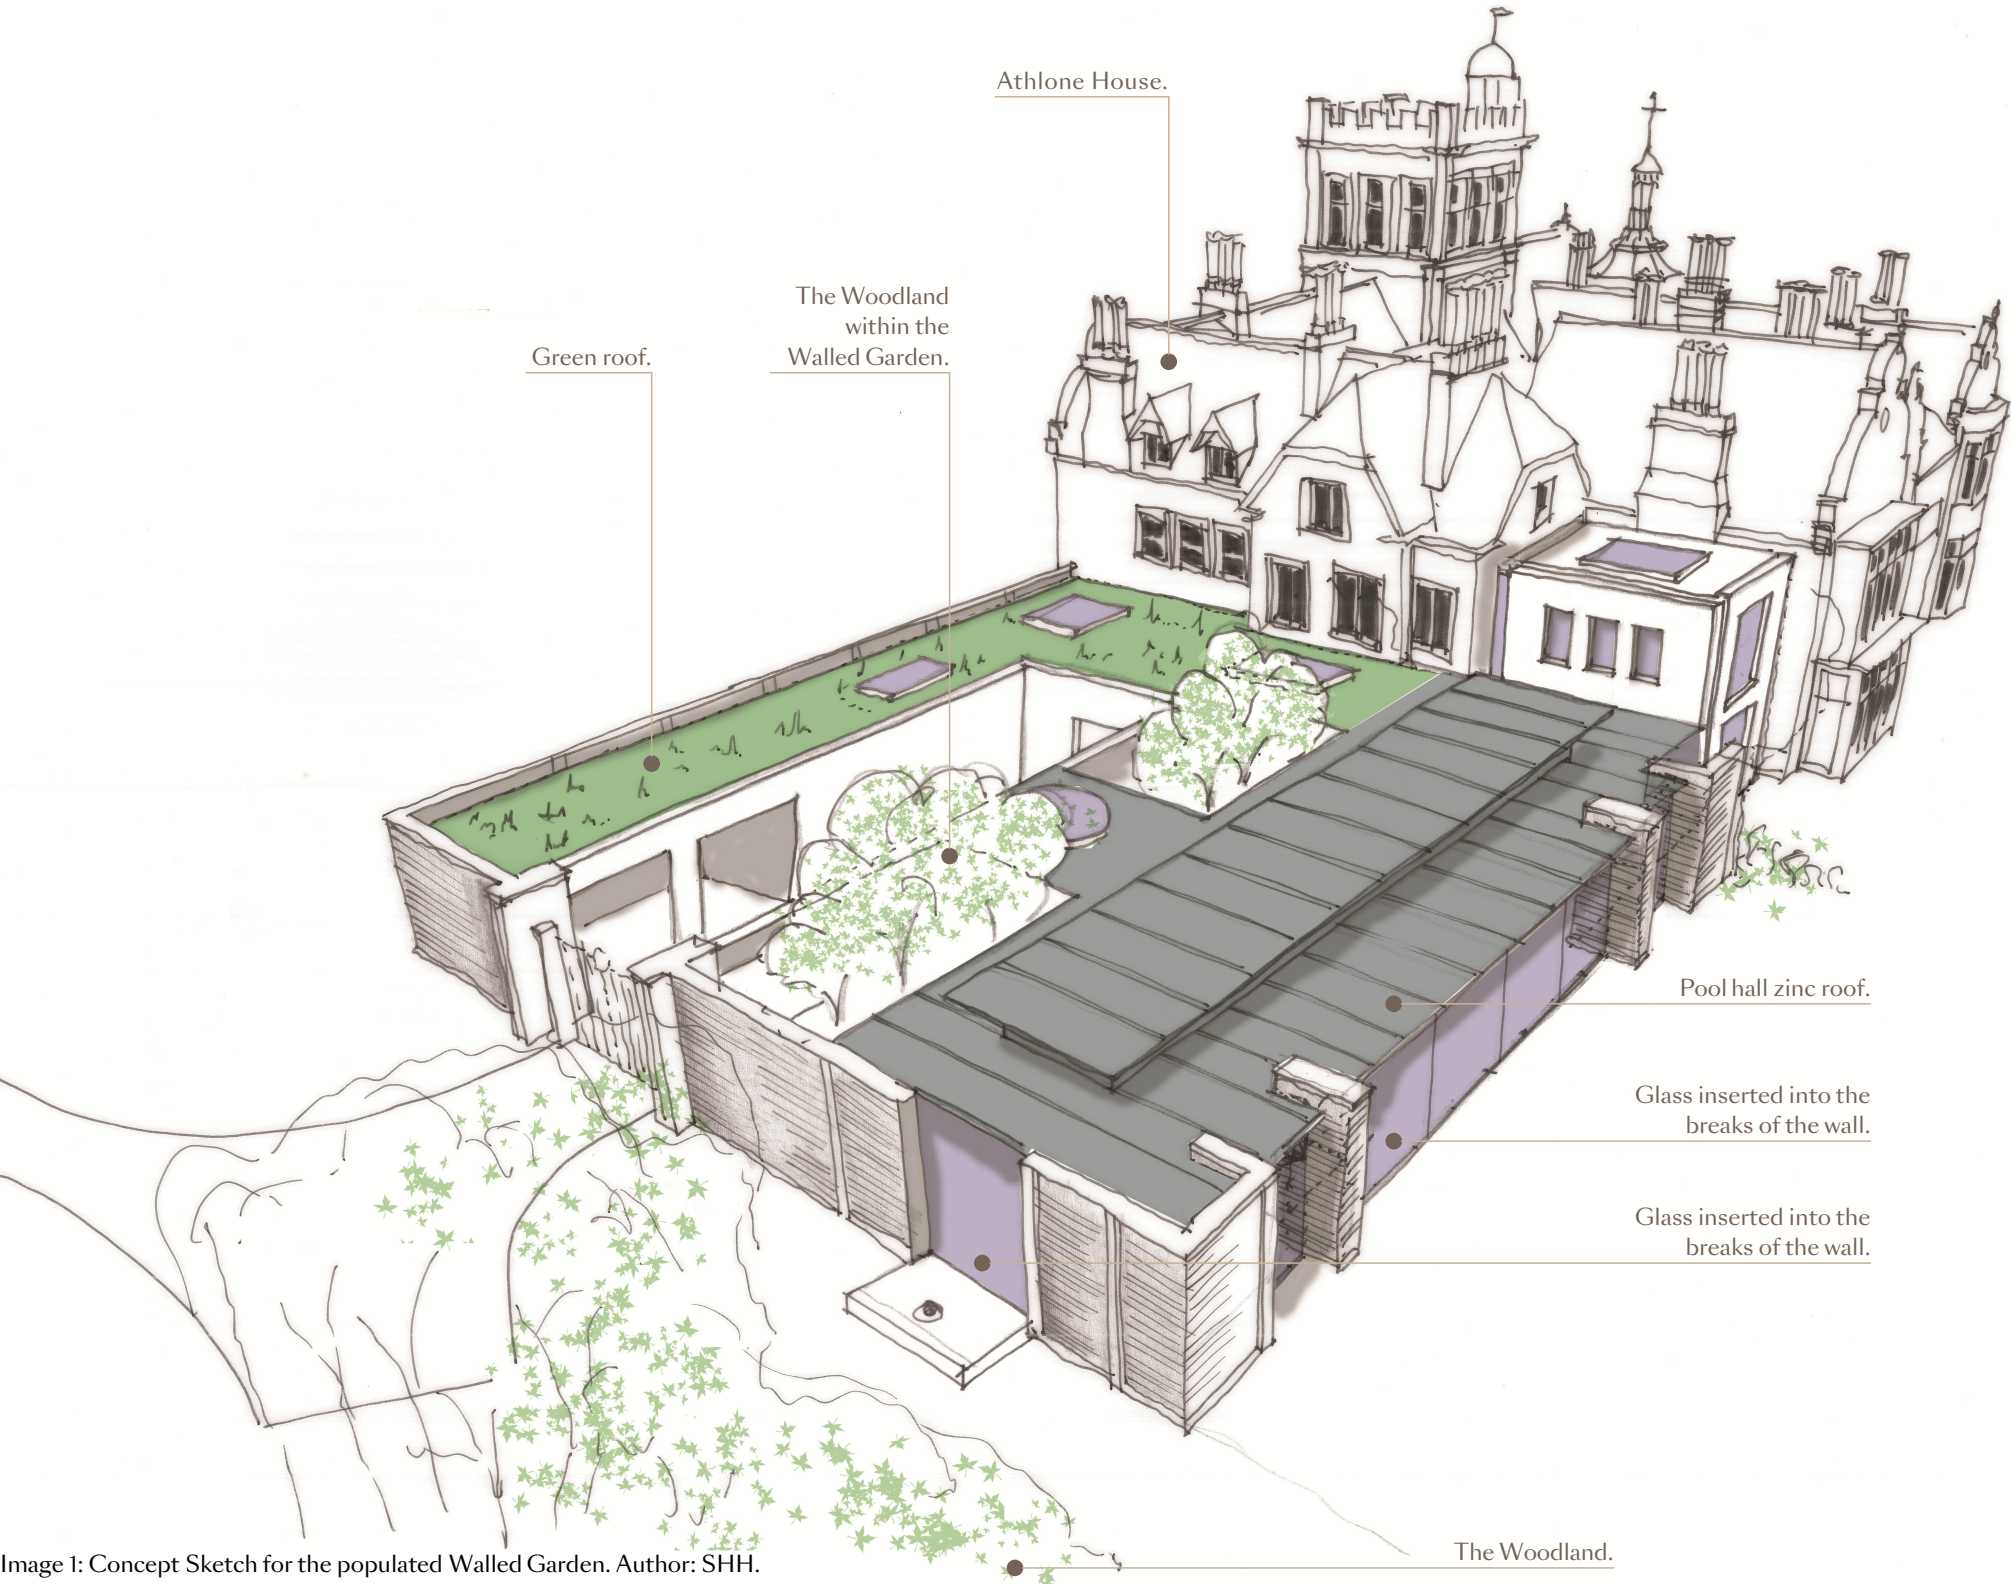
Concept Sketch for the populated Walled Garden. Author: SHH.
